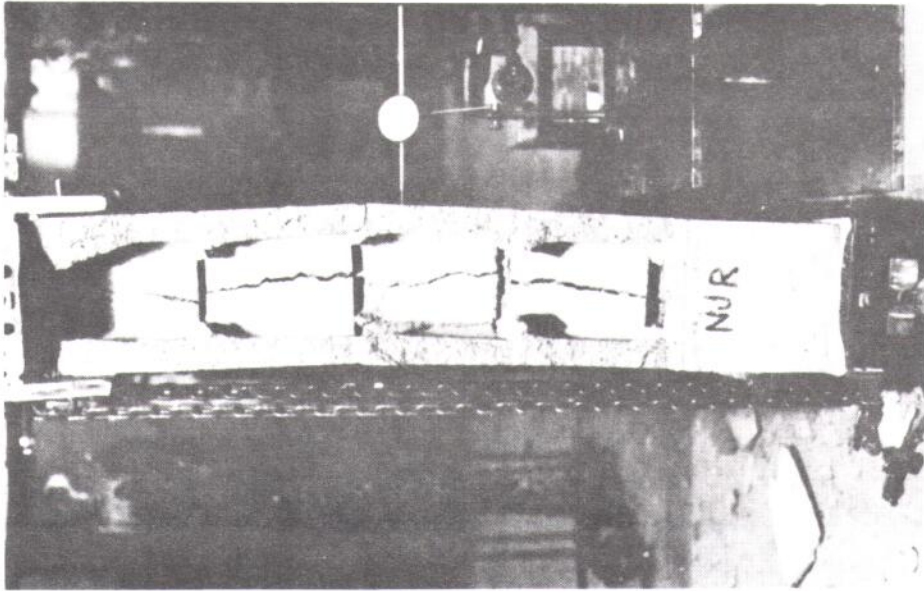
Failure of axially loaded hollow concrete block masonry wall.
